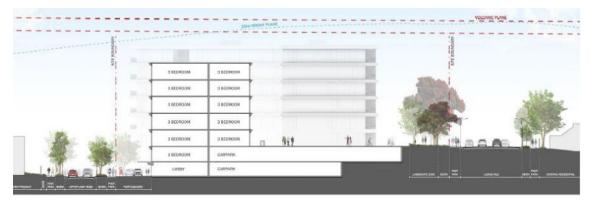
Section through Building C2. Demonstrates sub podium parking and sleeving of parking to Upper Loop Road.
